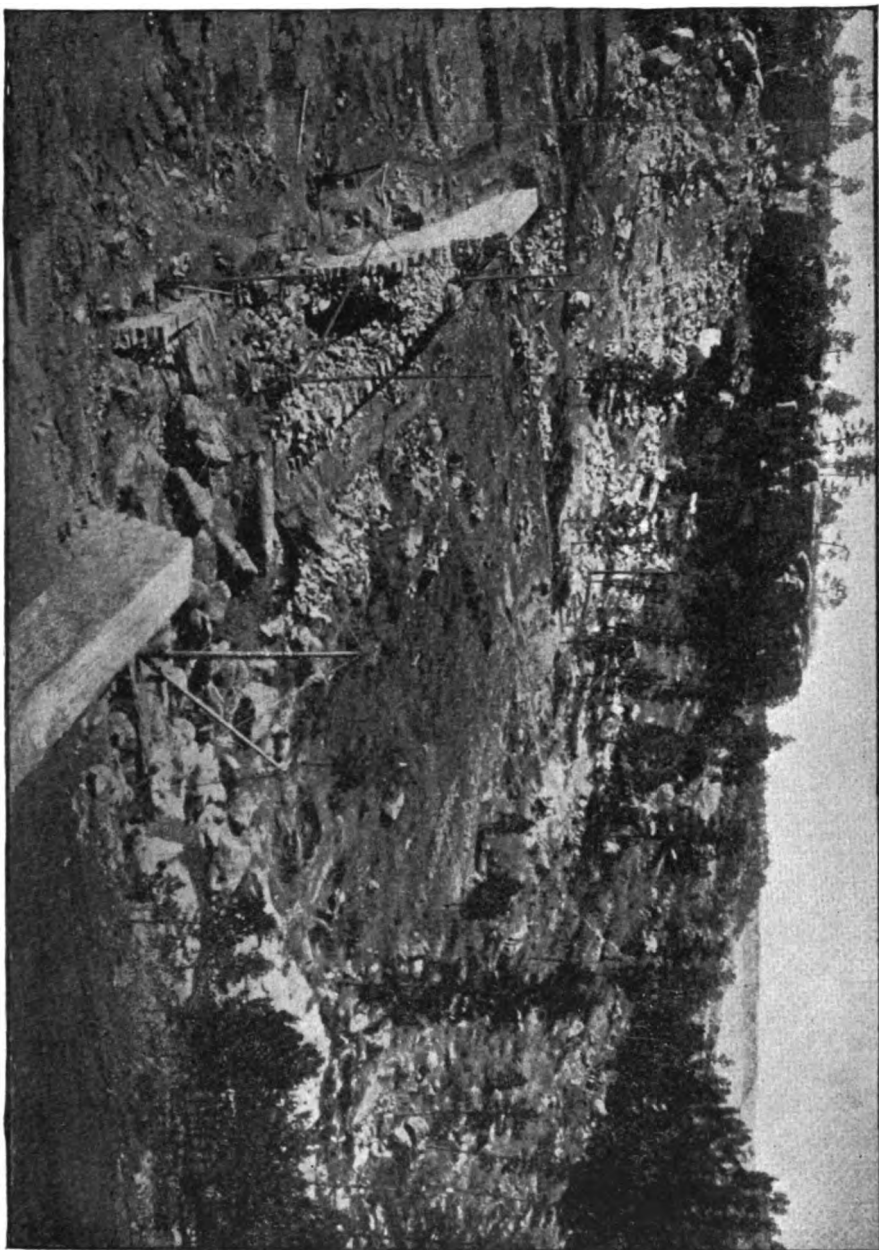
VIEW OF CASTLEWOOD DAM, COLO., DURING CONSTRUCTION, LOOKING NORTH.
